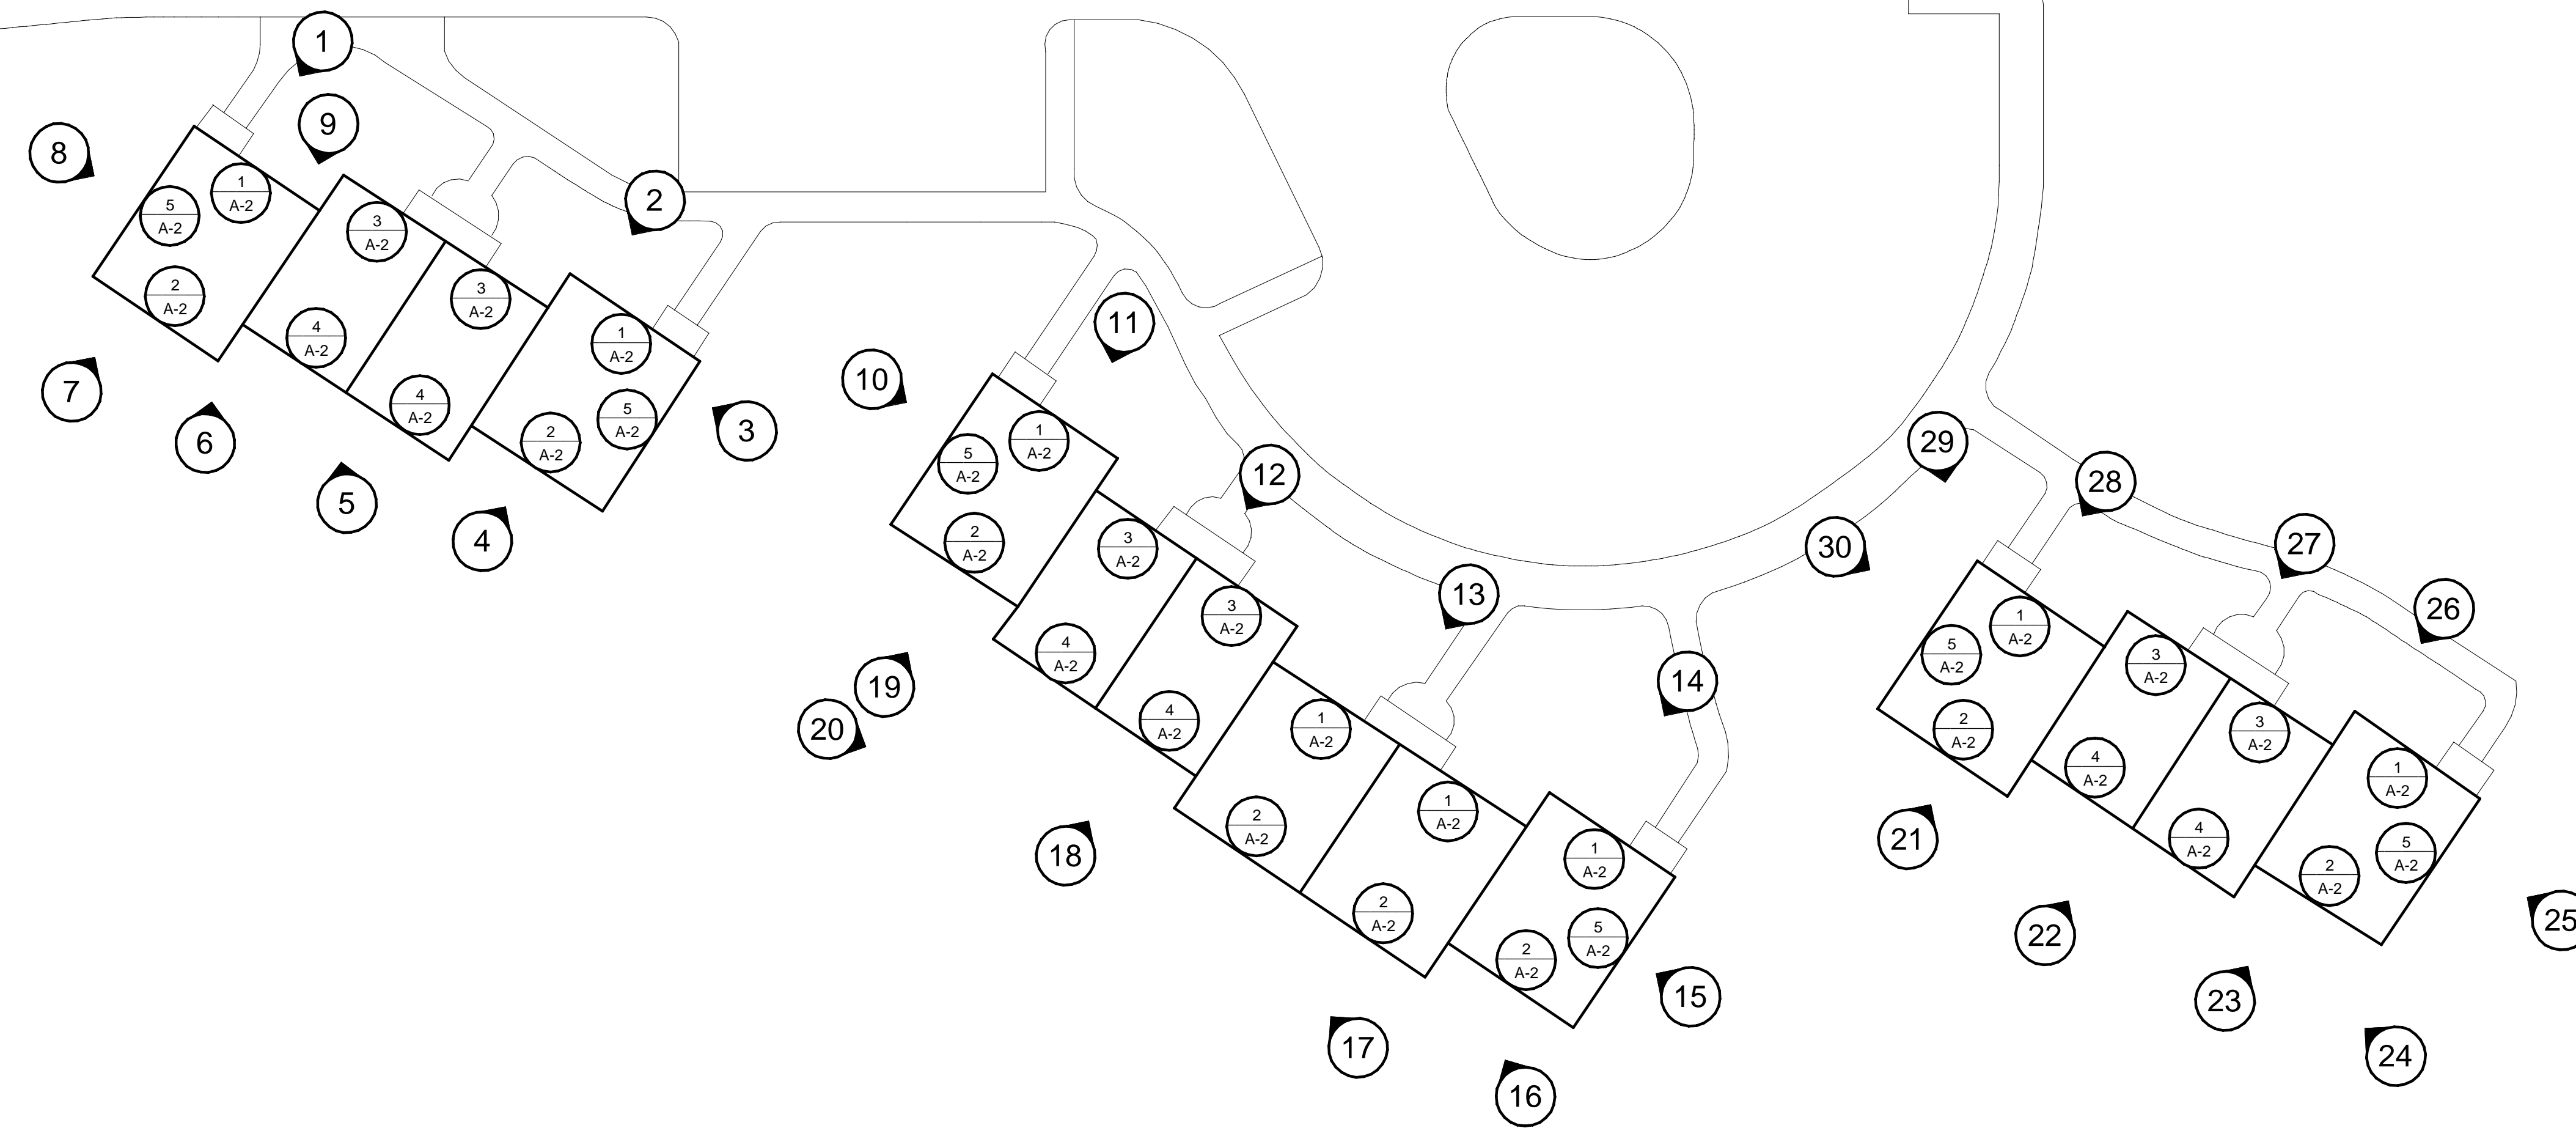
PHOTO. REFER TO SHEET REFERENCED ON PLAN TITLE
